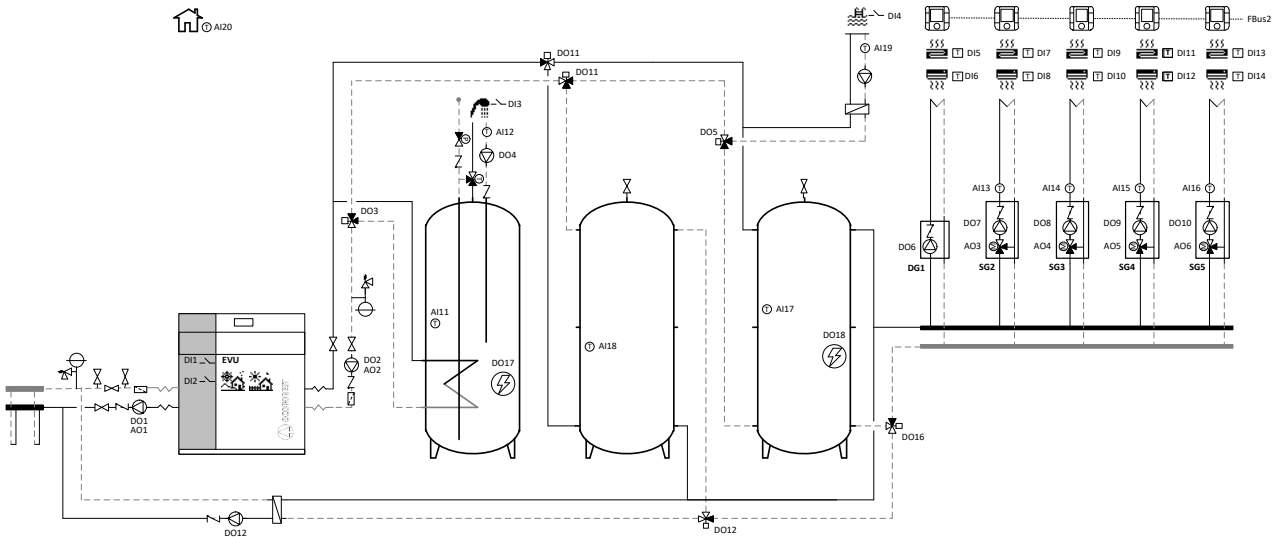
Wiring scheme using two buffer storage tanks (ecoGEO HP3 models).
